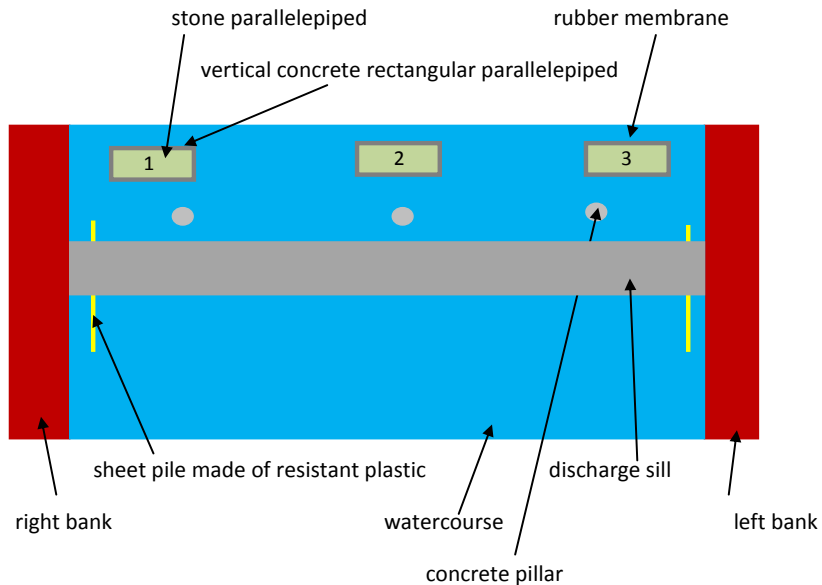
Positioning the three parallelepipeds and the metal sheet piles - indicative scheme
